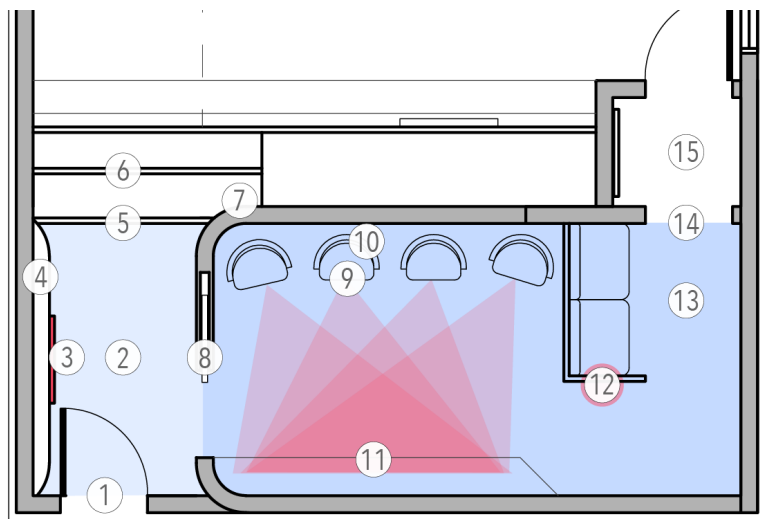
Floor plan for Room #1: The Pullman Sleeping Car
